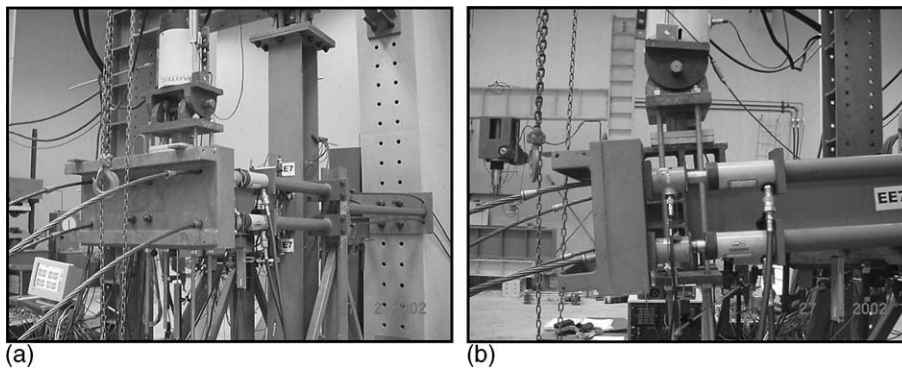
(a) Tensile axial application system and (b) hydraulic jack layout.
